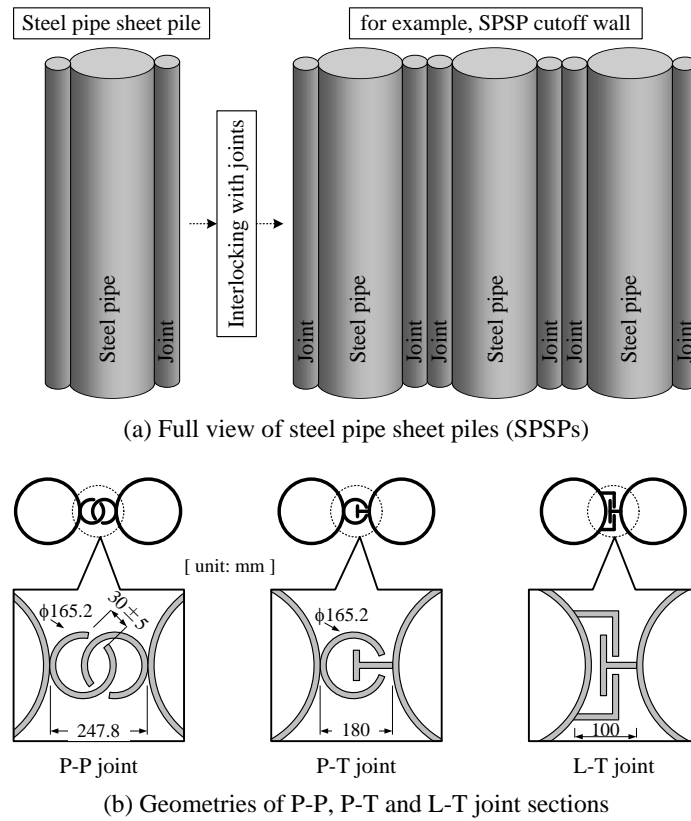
Schematic diagram of steel pipe sheet piles with joint sections
